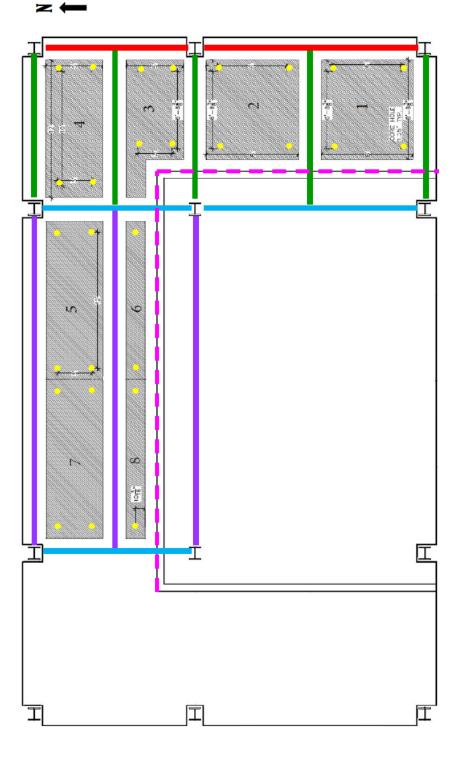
Coring and cutting diagram from ENGR TECH 1 with the locations of the structural steel girders (blue and red) and beams (purples and green) superimposed on the diagram. Also shown is the floor splice plate (dashed pink) and coring holes (yellow dots).
